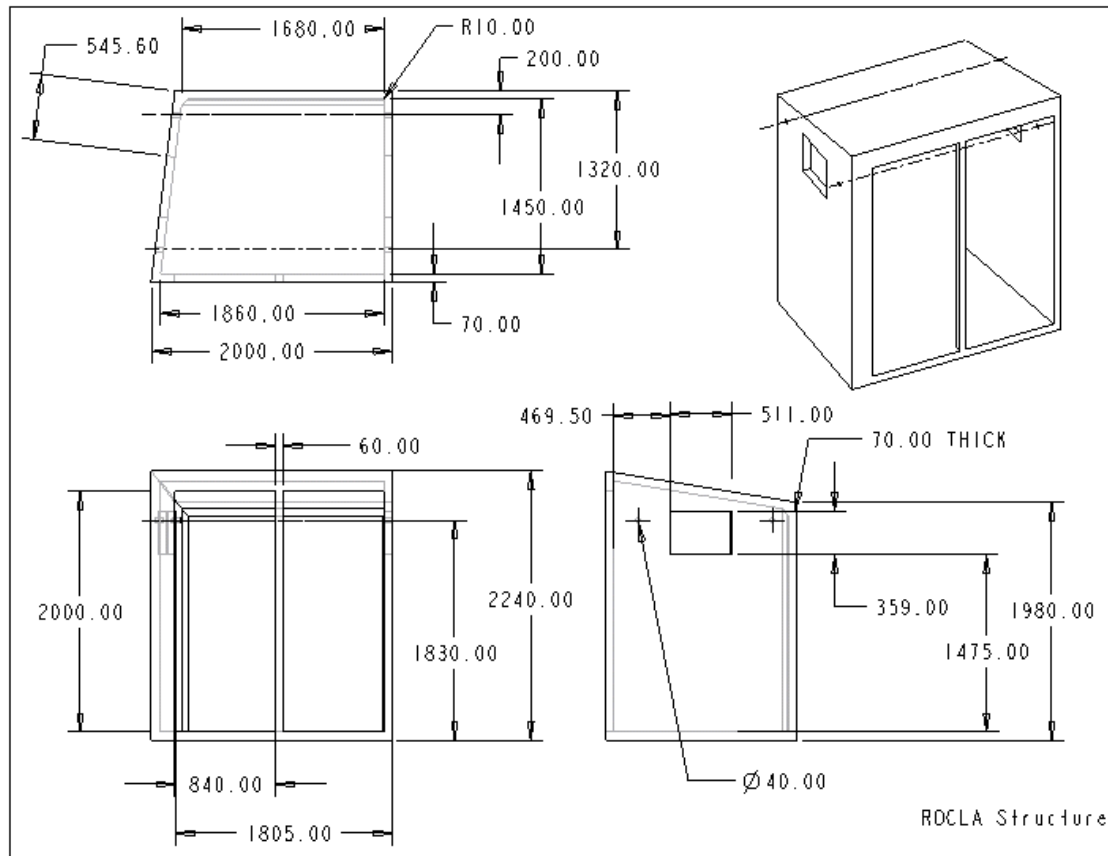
ROCLA large concrete unitized bathroom dimensioned drawings
